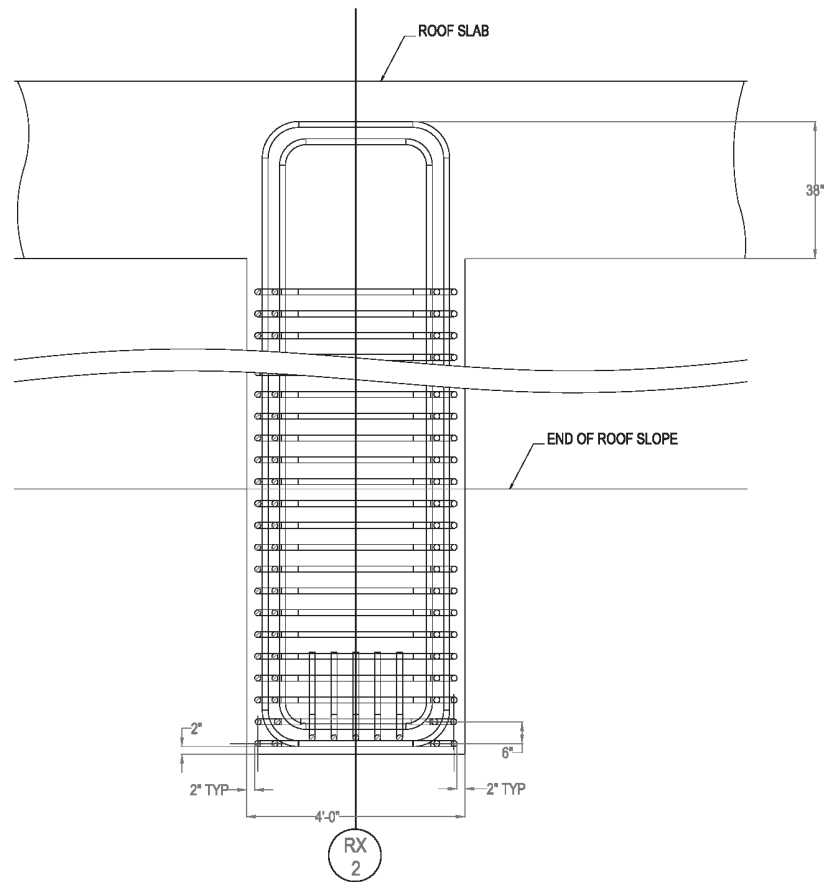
Stiffener Wall Vertical Reinforcement Anchorage into Roof Slab
